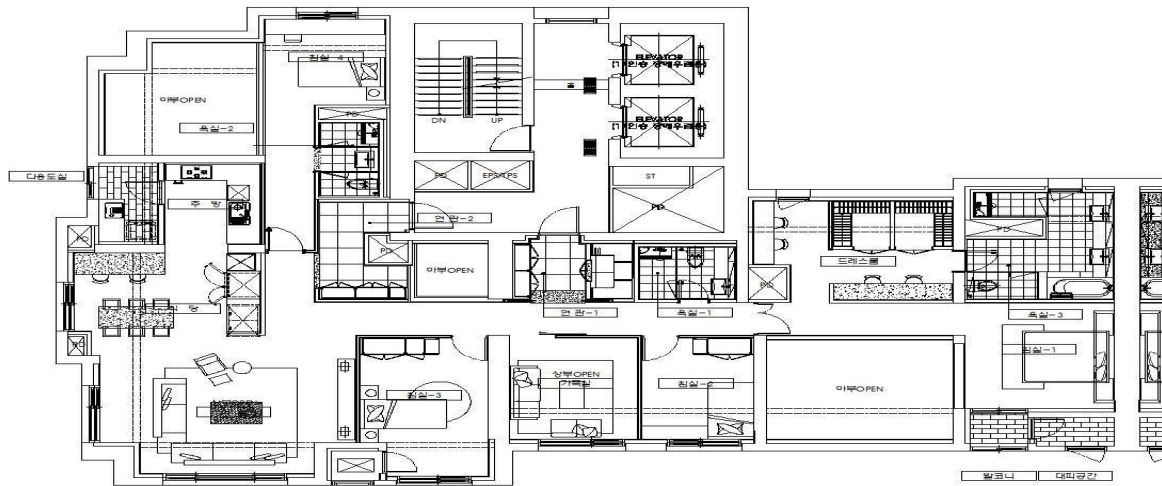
109m² type unit plan for ○○ apartment in Incheon
